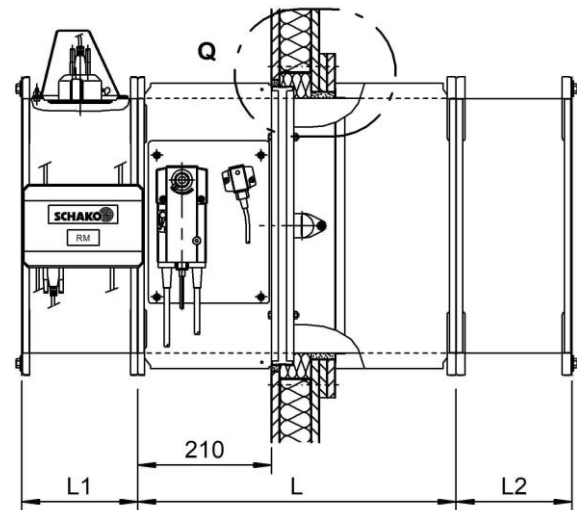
Wall panelling and double-board layers (lightweight partition wall)
